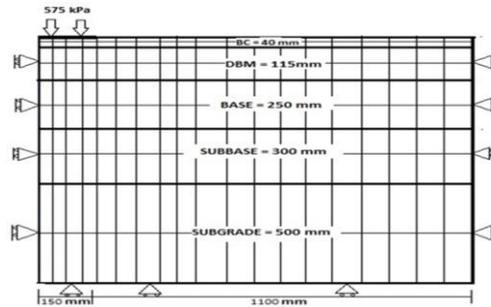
Finite- element discretization of pavement section for unstabilized subgrade soil B
